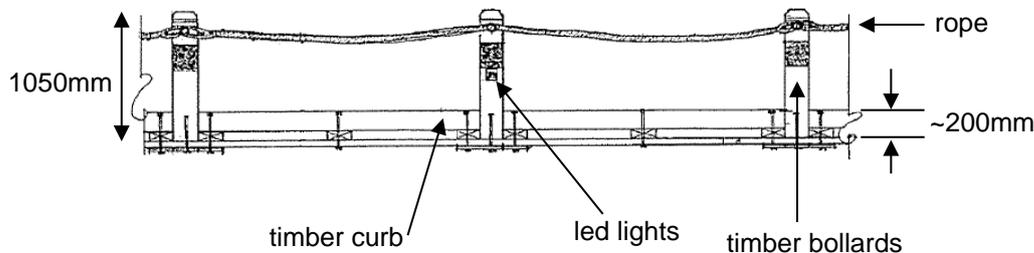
Diagram of original proposed barriers to the walkway (not to scale)
